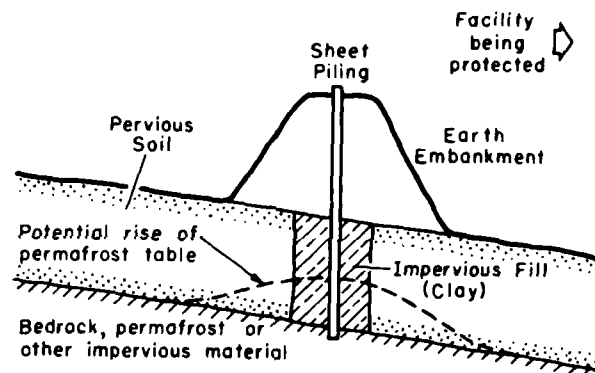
Typical cross section of a frost belt installation.¹⁸
